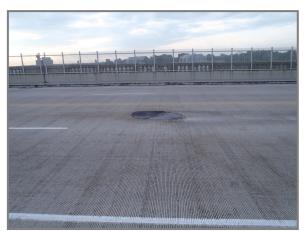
Isolated spall with asphaltic patch in the deck surface (westbound lanes shown).
